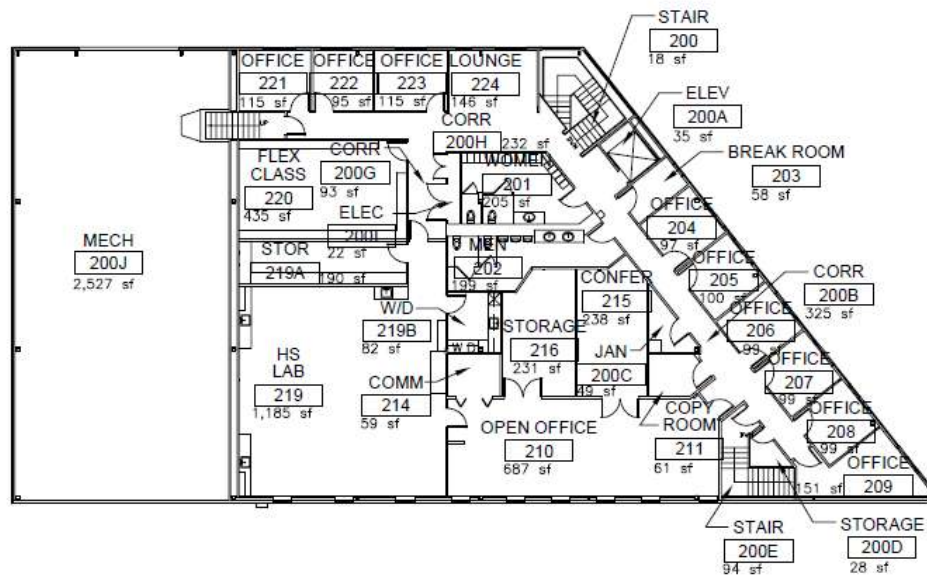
TEC building layout as shown by excerpts from drawings, second floor layout
